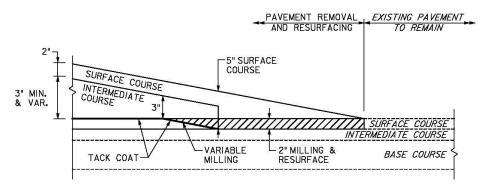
19: TURNPIKE PAVEMENT REMOVAL AND RECONSTRUCTION DETAIL
